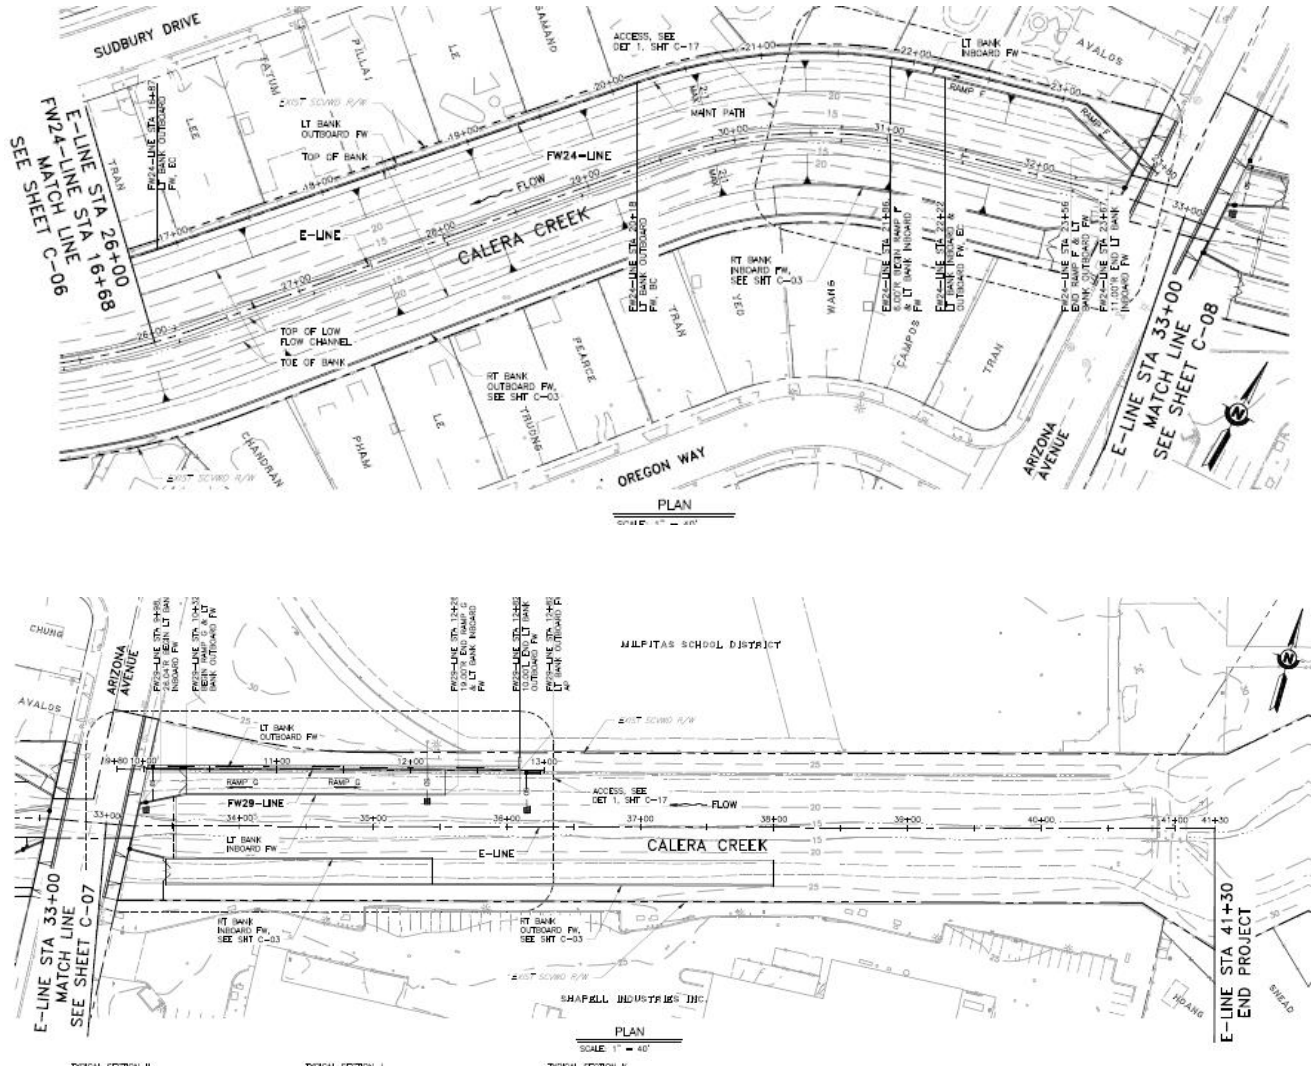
(concluded): Drawings Showing Civil Design of The Lower Calera Element
